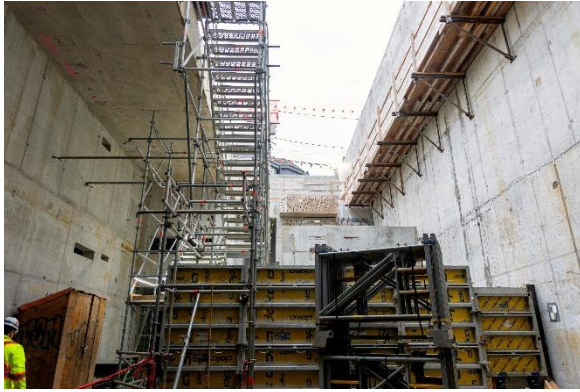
Oak-VGH Station: Progressing with concrete pours for interior walls in the headhouse.
